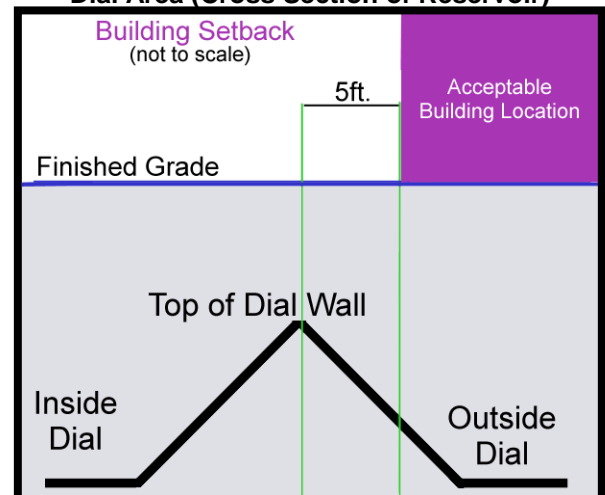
Required Building Setback Near Dial Area (Cross Section of Reservoir)
